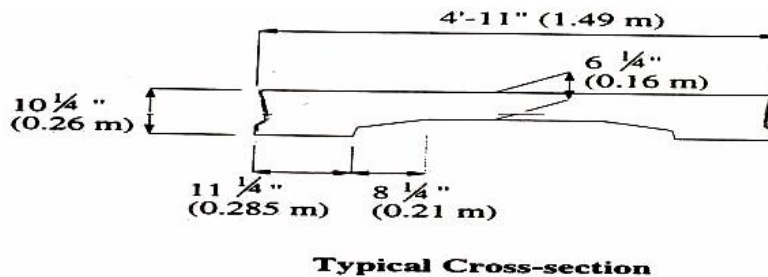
Cross section of the Suehiro Viaduct precast panels
